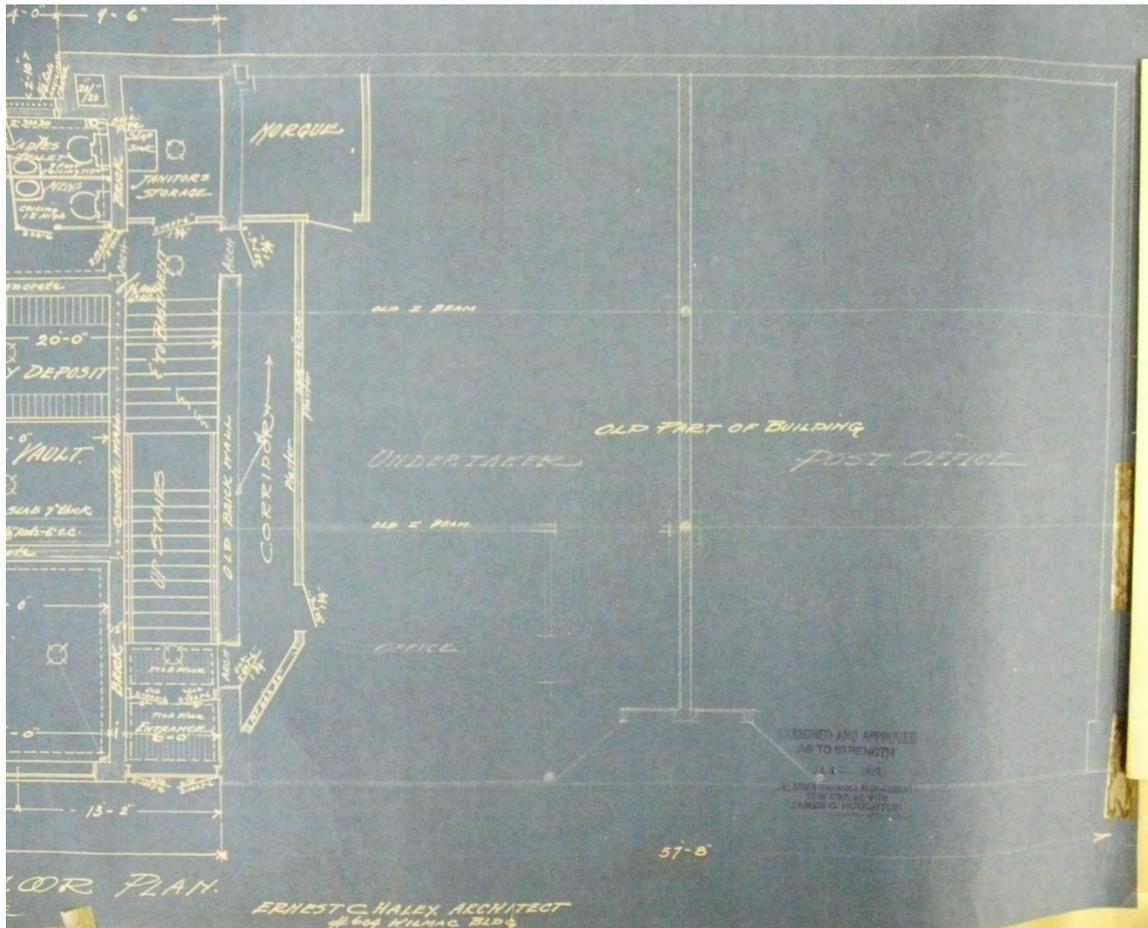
First floor plan 1910 building from Haley's drawing set, source: Northwest Architectural Archives
